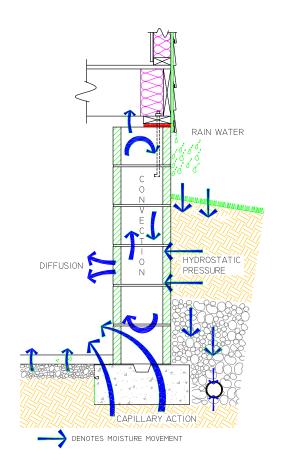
FIGURE A: HOW MOISTURE CAN ENTER FOUNDATION WALLS.
